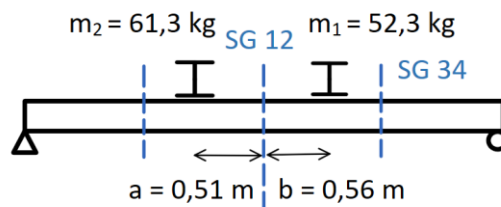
Figure of the set up for load situation 8 and 9, where two steel beams were placed on the slab depicting furniture such as chairs
